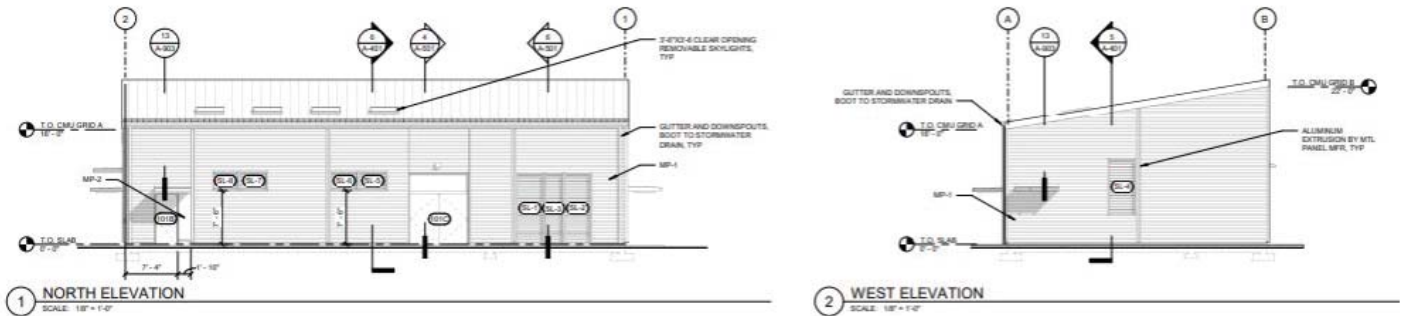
Sandy Pump Station Elevations Clip from Site Plan (Sheet A-101)
